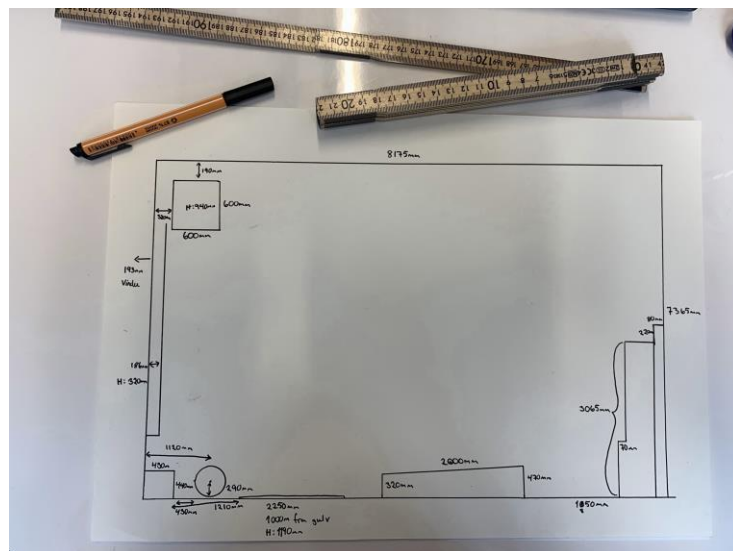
Carefully measured walls and objects on a floor plan sketch.
